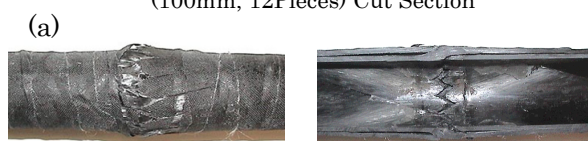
Failure Aspect of the Specimen No.3(100mm, 12 Pieces) (a) Appearance, (b) Cut Section
